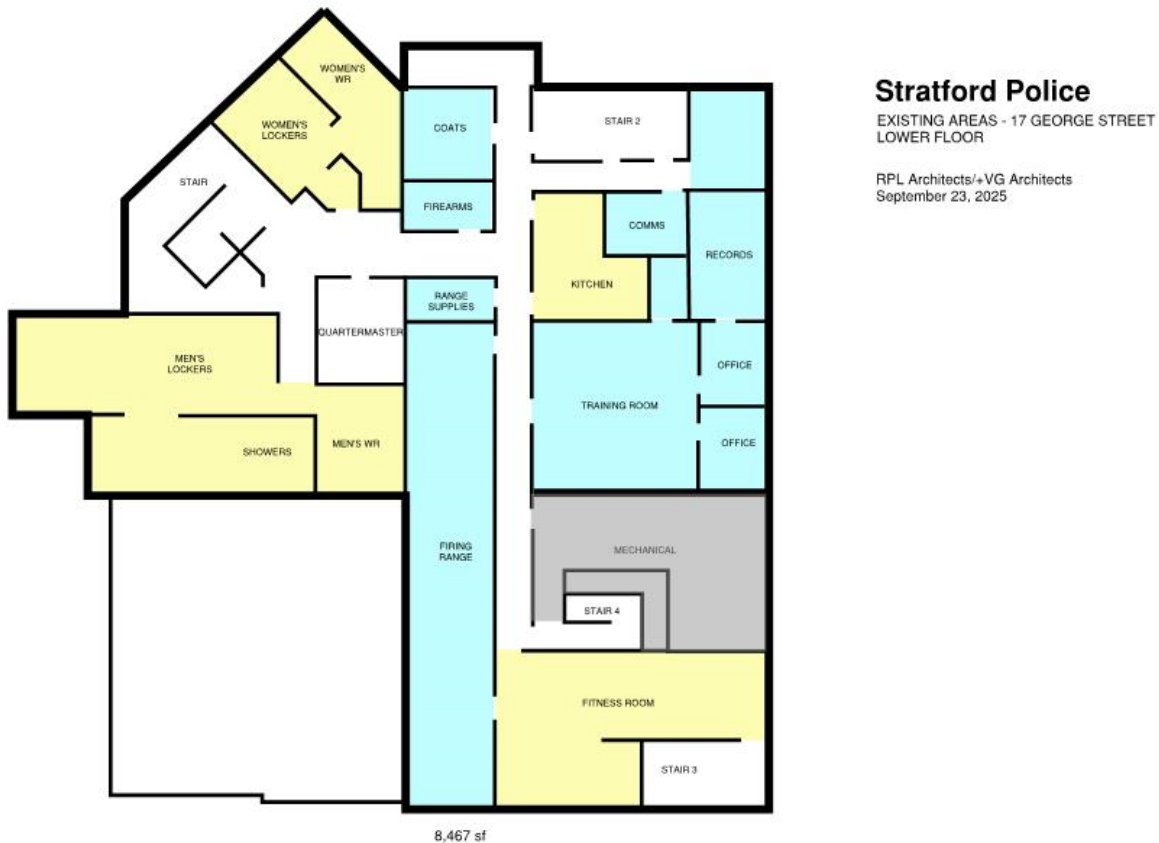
Lower Floor Plan, 17 George Street
